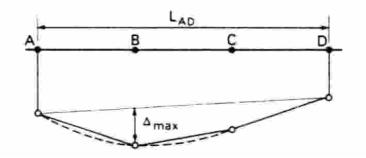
Simplfied scheme and nomenclature for each building façade/masonry wall element
